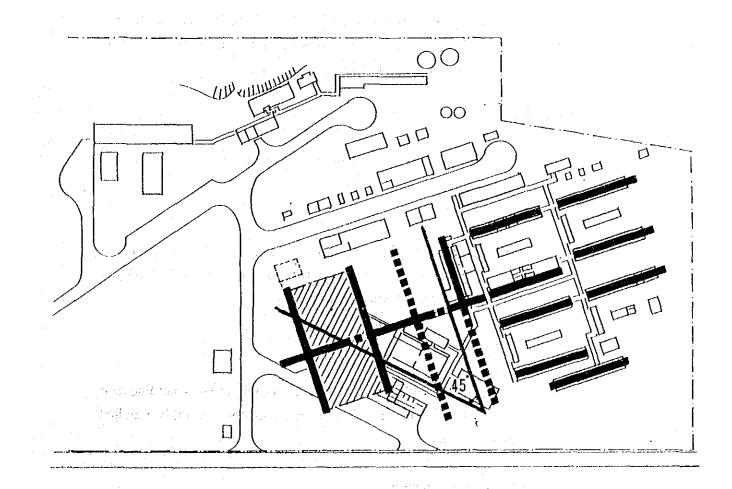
Madang Hospital Plot Plan Concept
